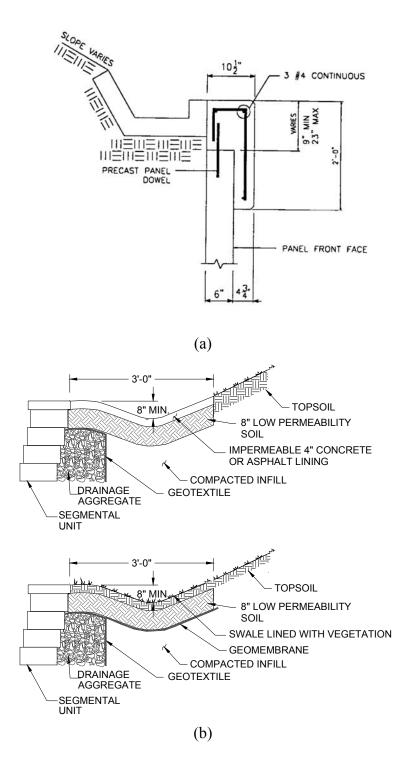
Example drainage swale near top of wall. ((b) Collin et al., 2002).
